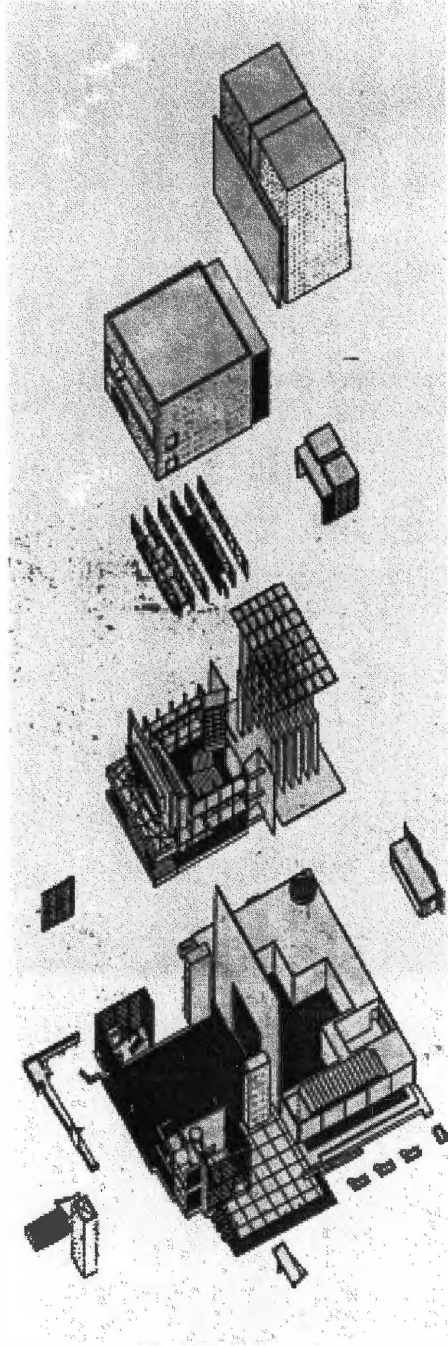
, *CENTER FOR THE ARTS, EXPLODED AXONOMETRIC (COOLIDGE)
